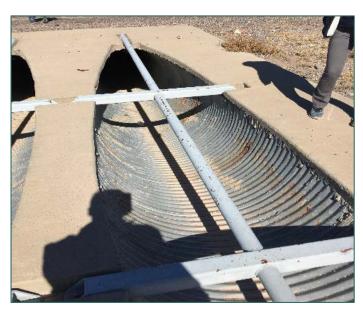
2 X 48-inch CMP Culverts on the West Side of NM 26
